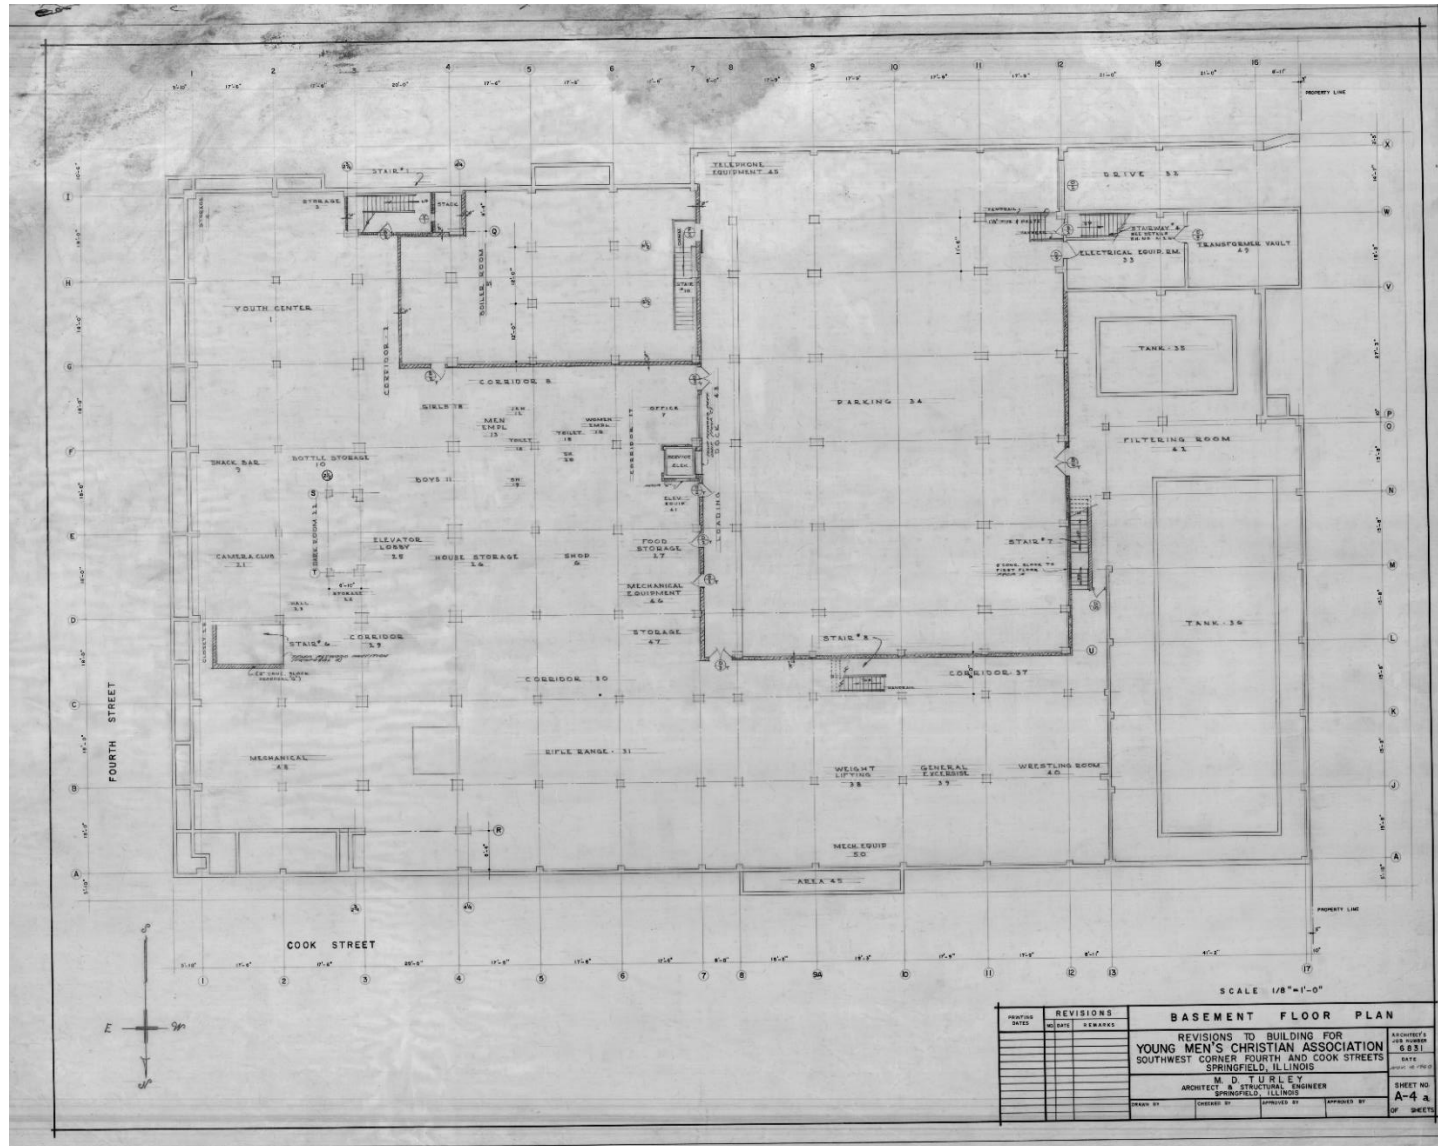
Basement Floor Plan (Turley 1960; Sheet No. A-4a) [November 4, 1960].
